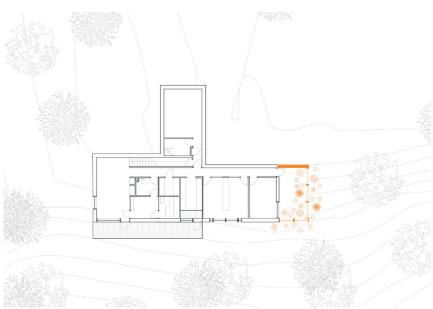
Original plan of Villa Sarvilahti by Archdaily, Altered by authors.
